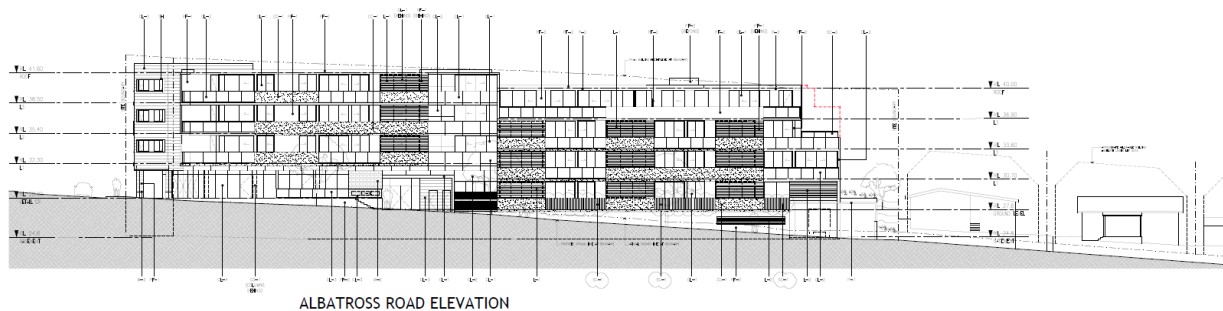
Elevation of the proposed development (western elevation – Albatross Road)
